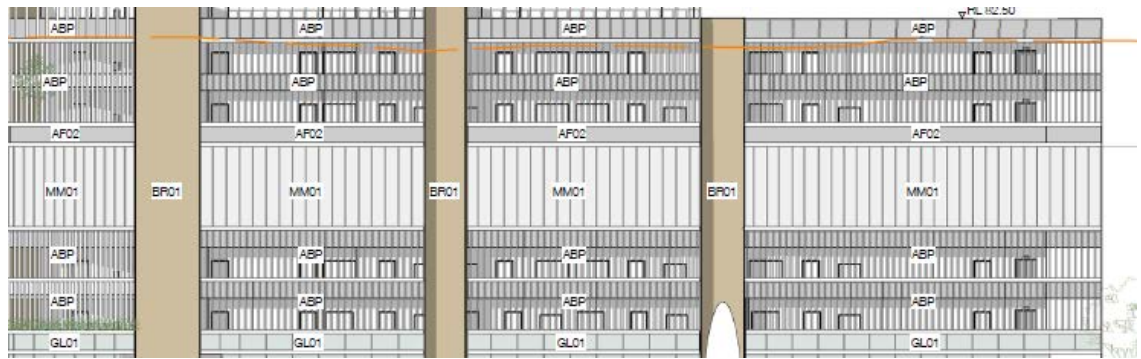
Devlin Street Elevation -Exposed doors and windows through proposed open battens to façade
